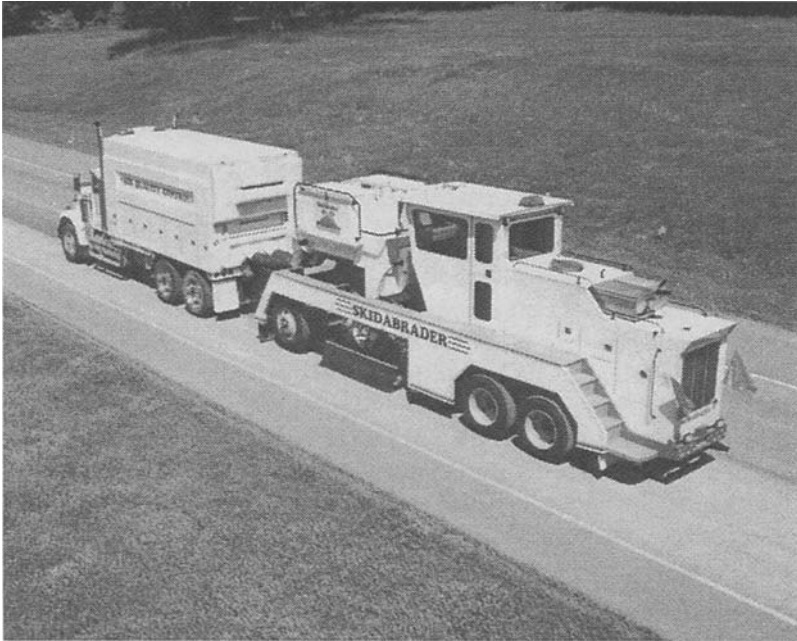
Skidabrader Equipment (Skidabrader 2004).
